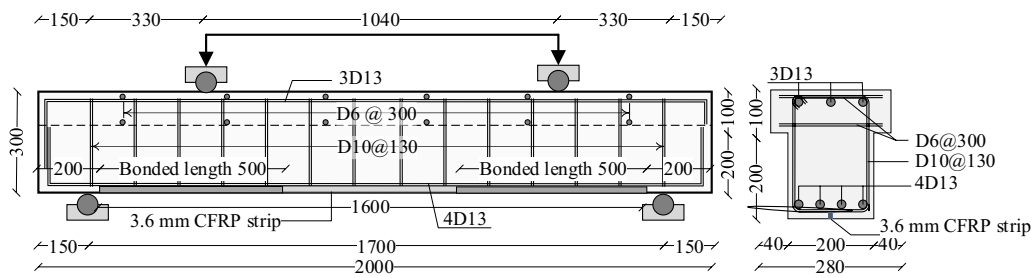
Geometric and reinforcement details of the beam specimens (unit: mm)
